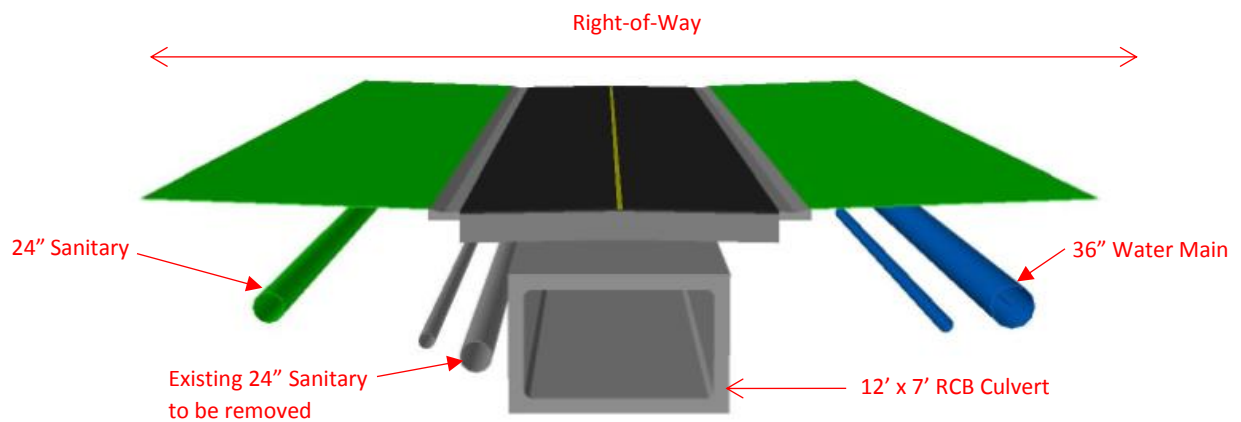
3D Rendering of Gray Street east of Howard Avenue Typical Section (NTS)
